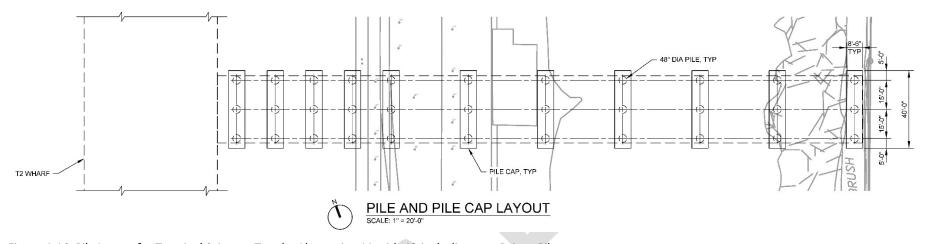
Pile Layout for Terminal 2 Access Trestle: Alternative 1A with 48-inch-diameter Driven Piles
